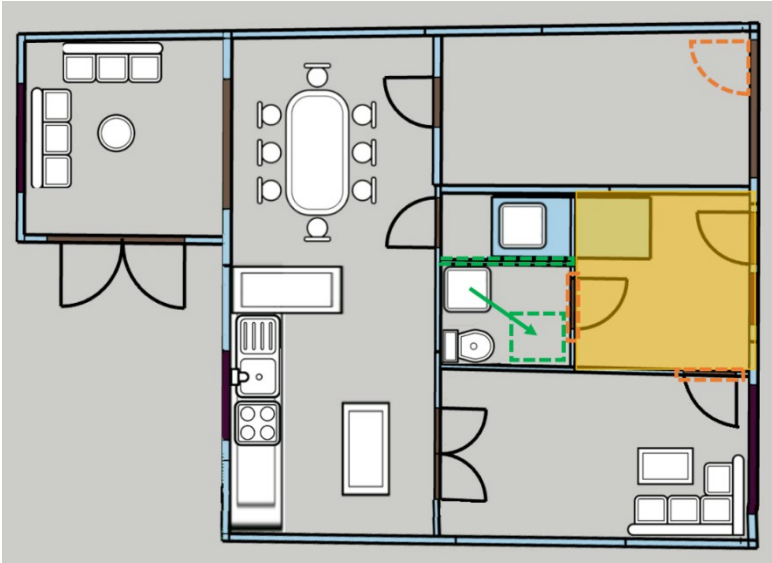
Alternative ground floor modification. Two doors are closed, a new entrance door is fitted instead of the garage door, an internal wall is removed and the shower is relocated. The hallway of the upstairs dwelling is marked in yellow.
